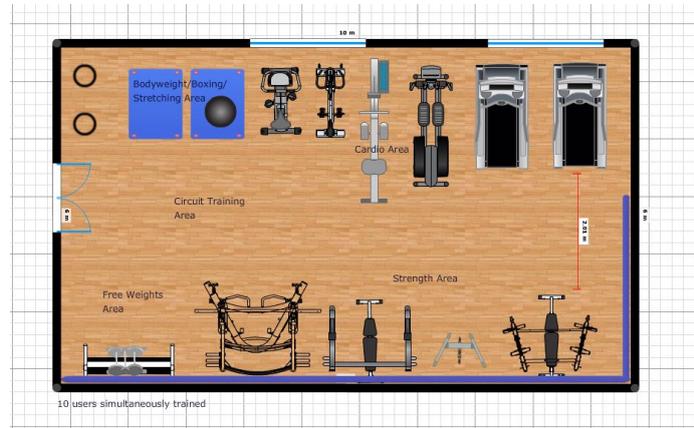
Fitness room Equipment Layout for a Two Pump Station
